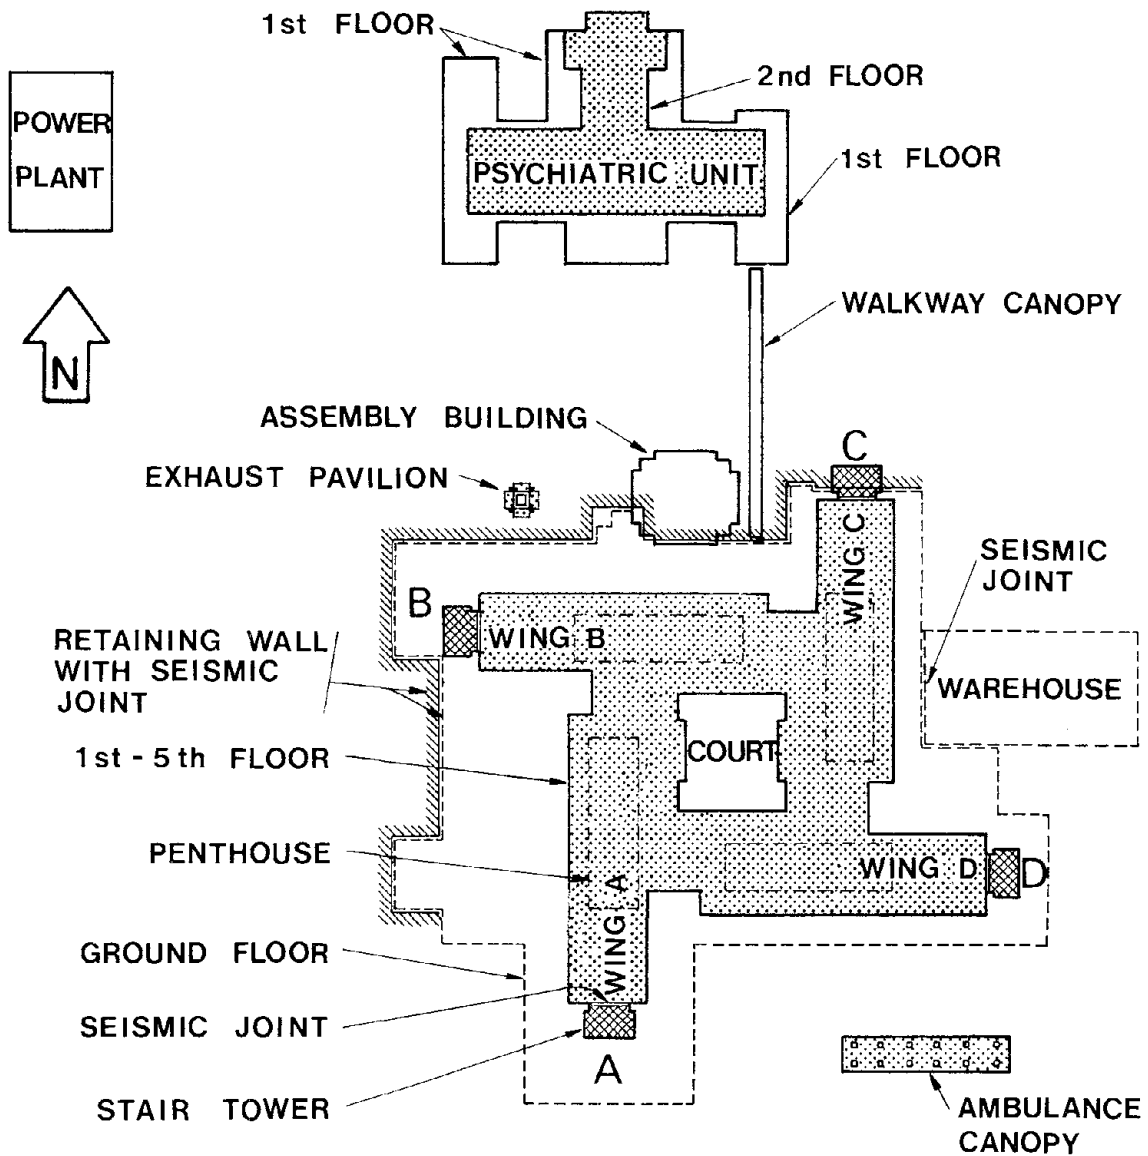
SITE PLAN OF THE OLIVE VIEW MEDICAL CENTER
